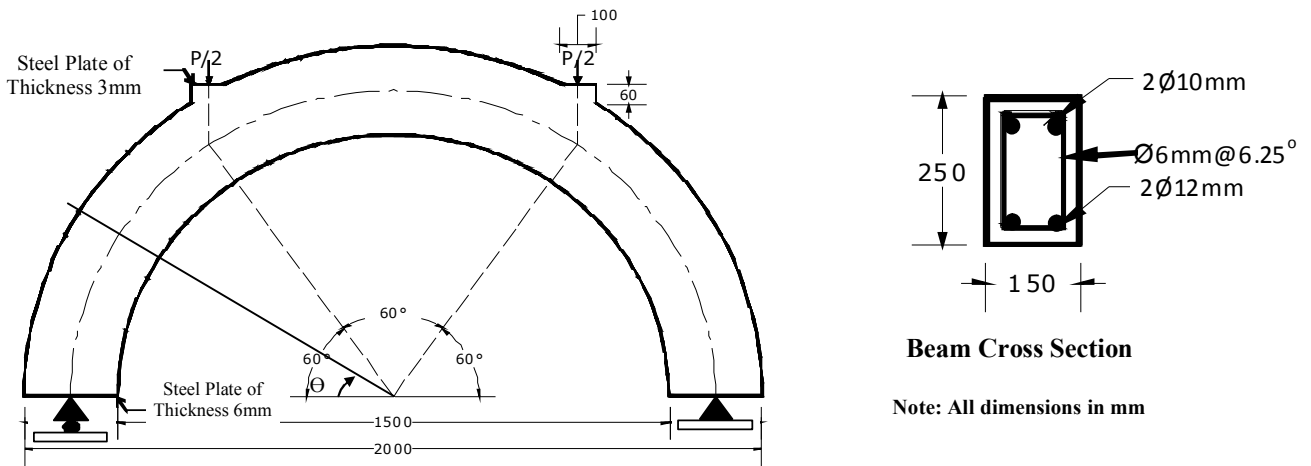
Geometry and Reinforcement Details of the Tested Arches
